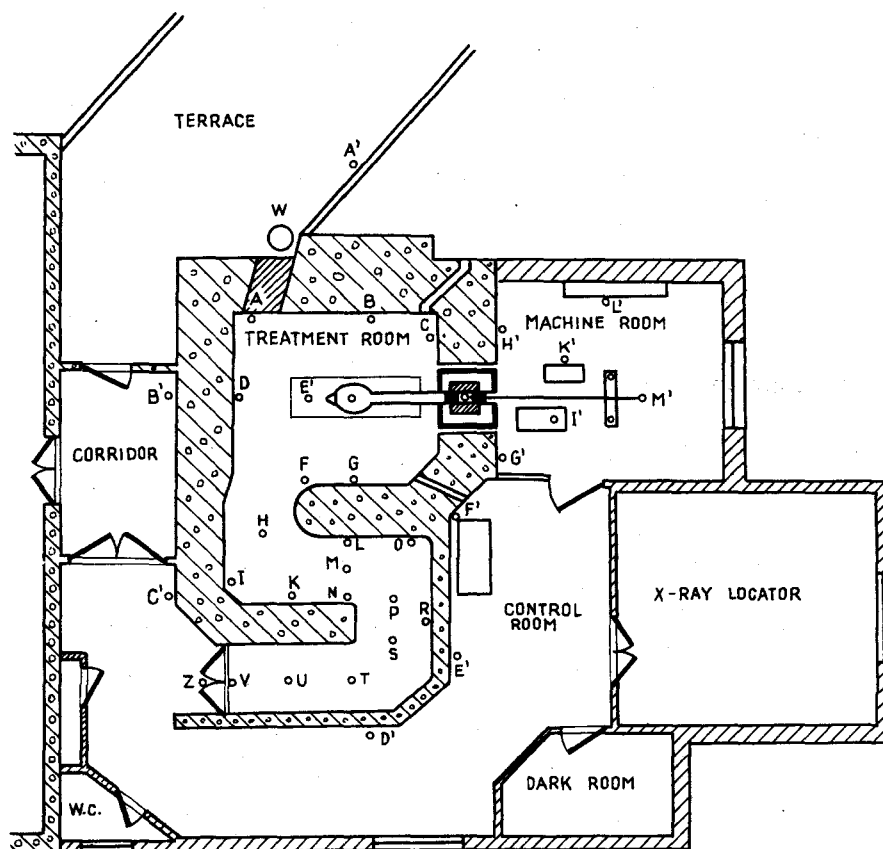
Floor plan of the Rotacert telecobalt unit.
